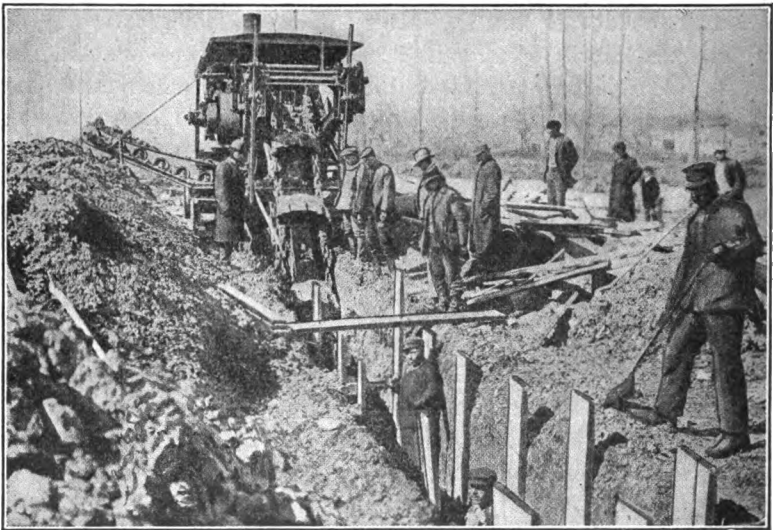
Austin trencher excavating a trench 36 in. wide and 15 ft. deep.
